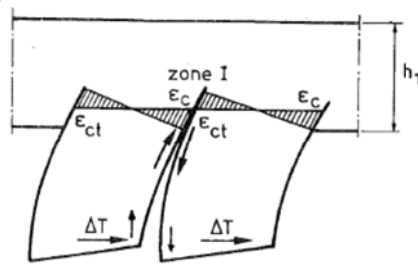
Concrete teeth (Pruijssers, 1986).
